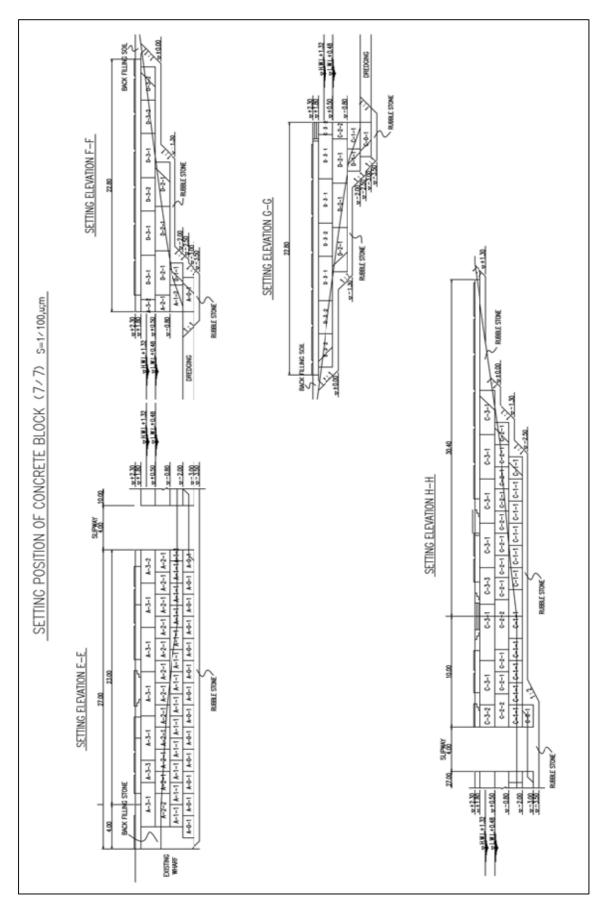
Setting Position of Concrete Block (Elevation Plan of Western Side)
